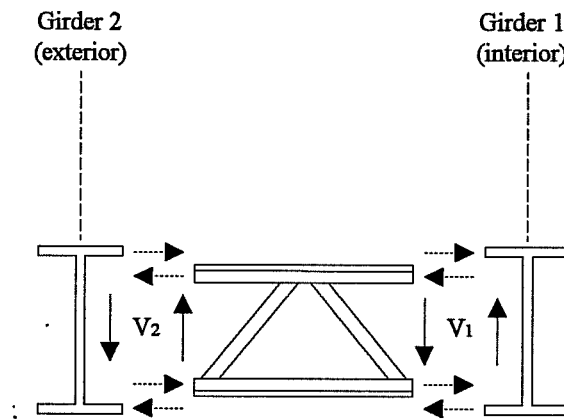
Equilibrating shear forces between the cross-frame and the girders
